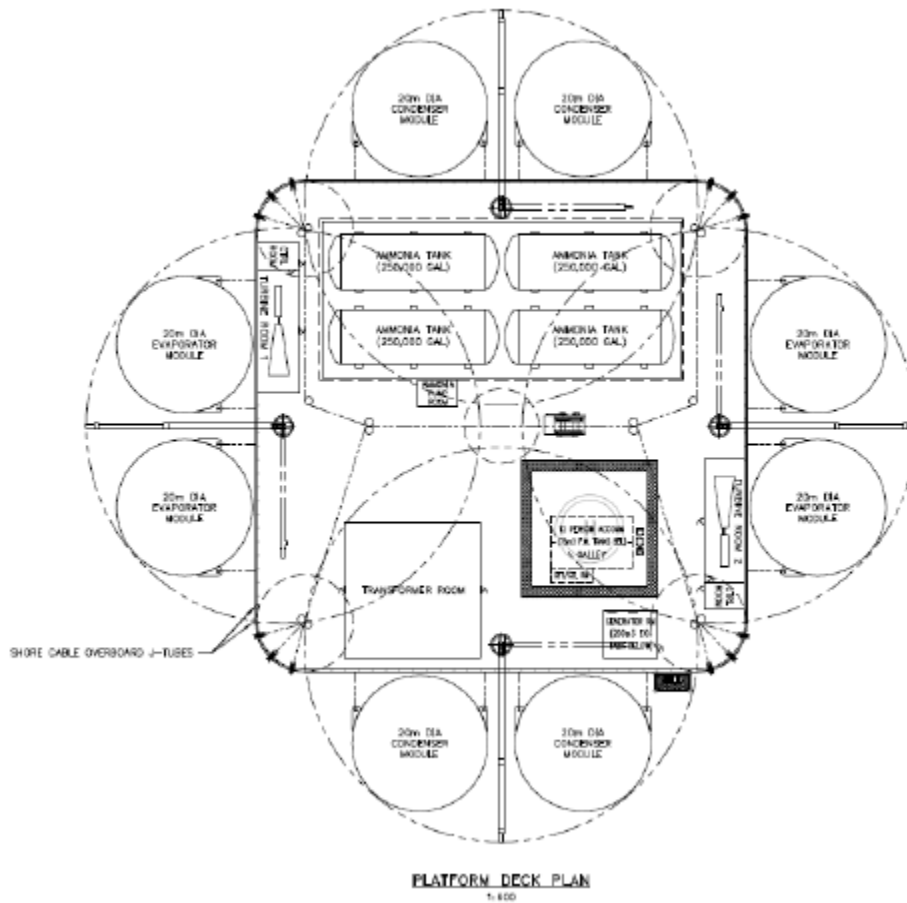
100MW OTEC Platform, Deck Plan
